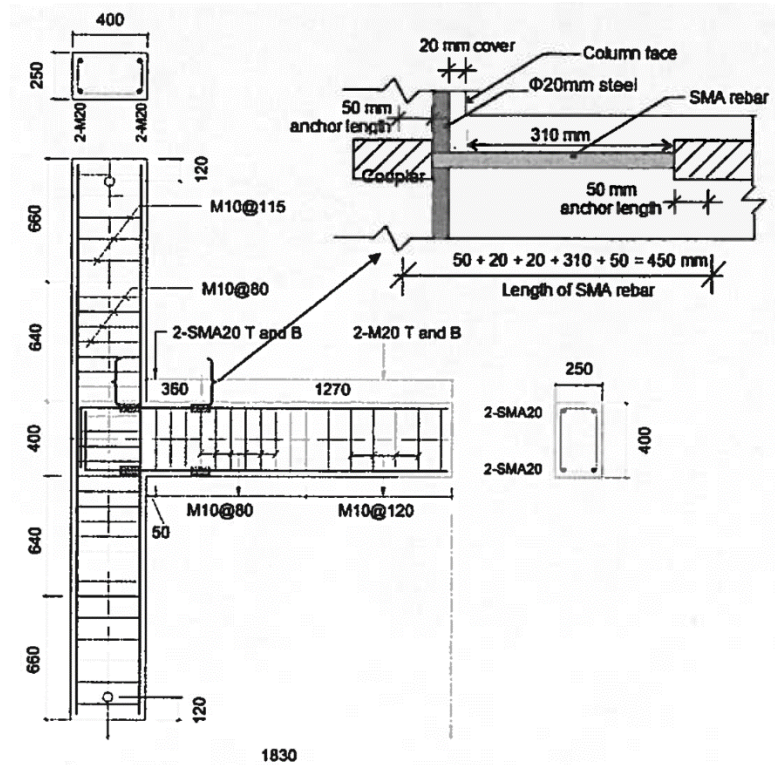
Reinforcement details of beam-column joint reinforced with SMA bars tested by Nehdi et al. (2011)
